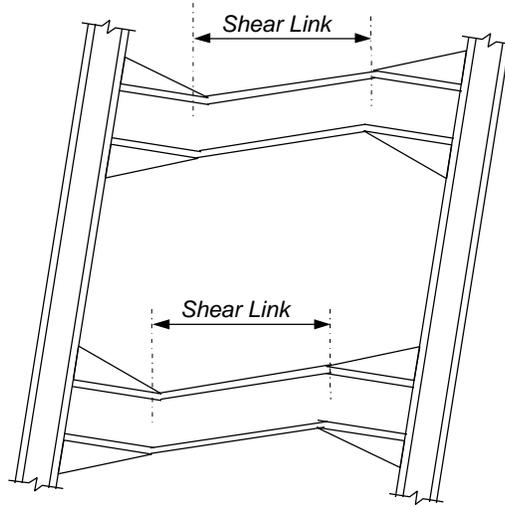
Shear Yielding Dominated Behavior of Short Bay Frames
